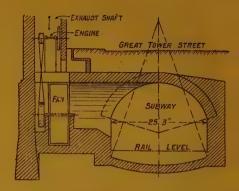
Ventilation equipment as originally constructed under Great Tower Street, London.
